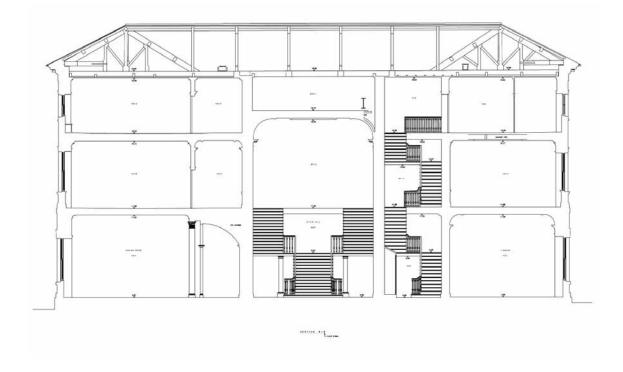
Lytham Hall north—south cross section, Foster survey drawing, with permission Lytham Hall Heritage Trust. The shown roof trusses are probably T2 and T13
